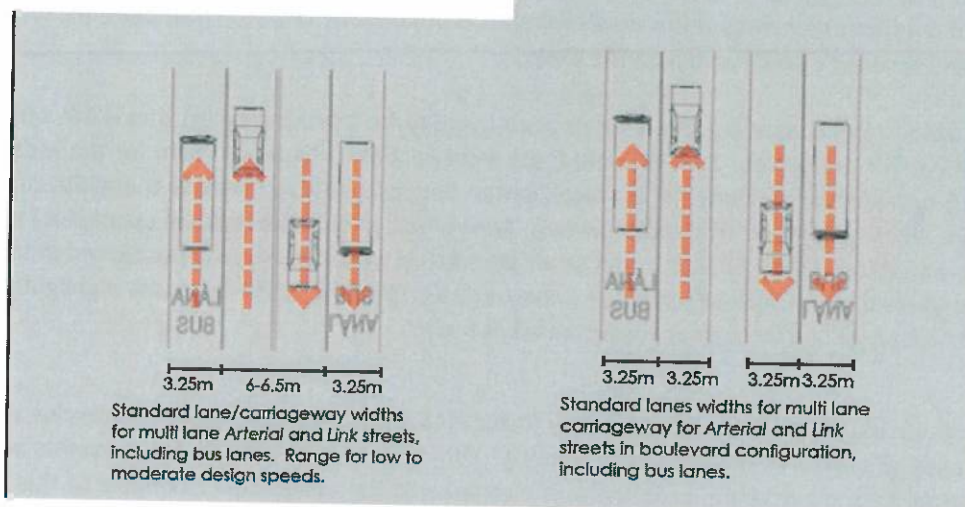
Extracts from DMURS Showing unsuitable lane widths. On page 113 DMURS states: “When carrying out upgrades, or traffic calming works on existing streets, the first priority of authorities should be to narrow existing carriageways where they exceed those standards listed above” Note these examples also show bus lanes of width 3.25m.
